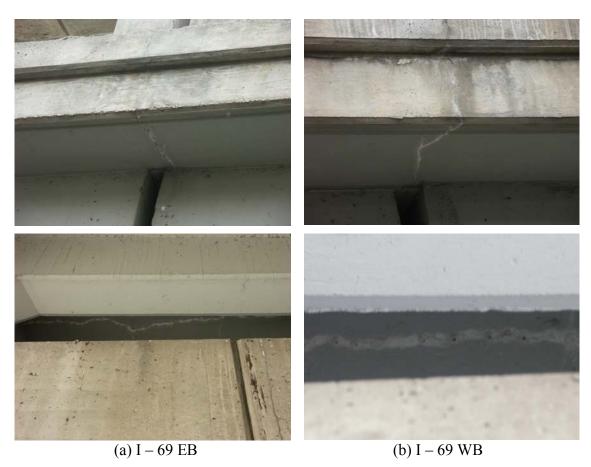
Link slab condition of I-69 (a) EB and (b) WB
